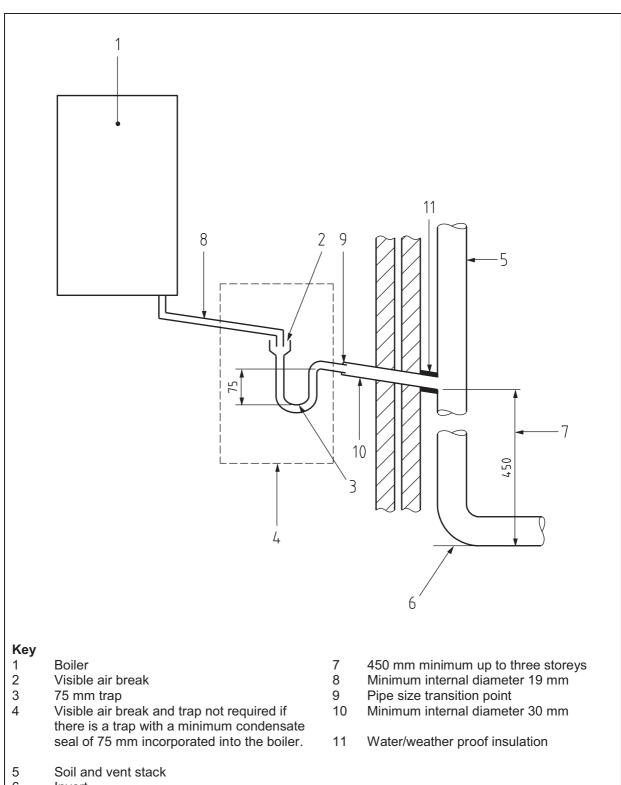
Connection of condensate drainage pipe to external soil and vent stack
